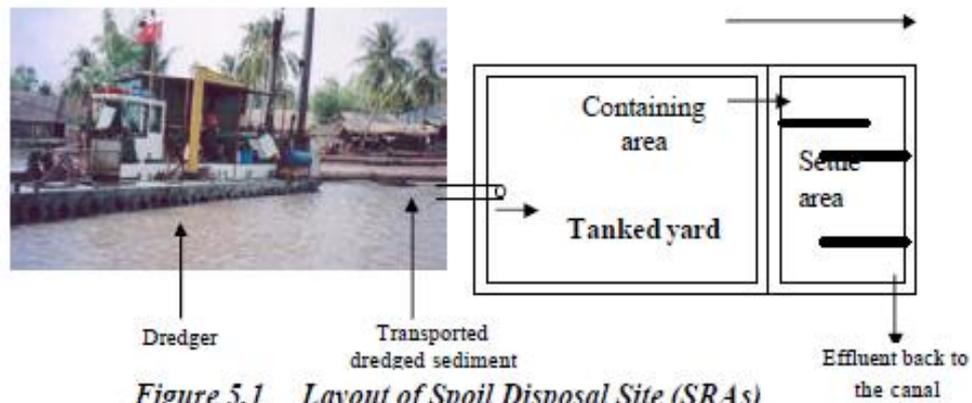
Layout of Spoil Disposal Site (SRAs)
